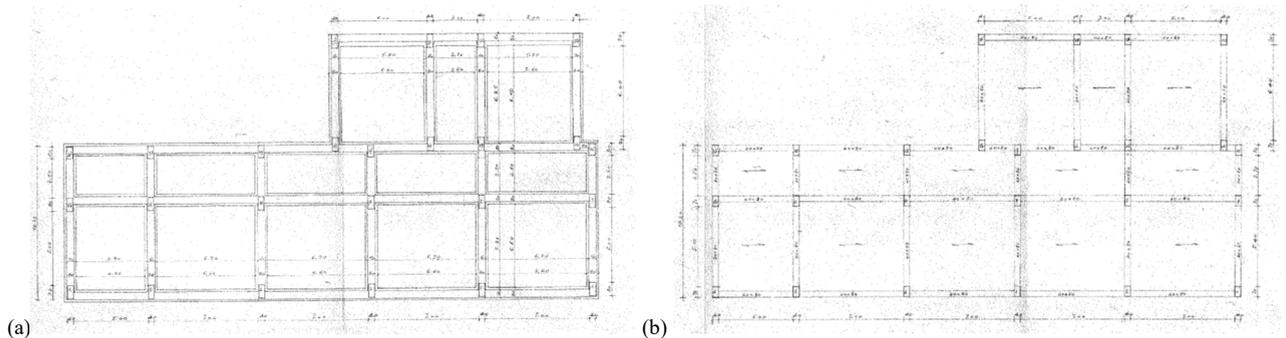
Original drawings of the design floor plan. (a) Foundations; (b) First floor.
